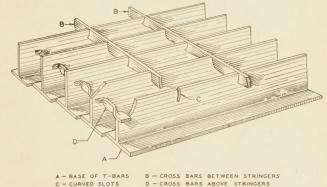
ASSEMBLY OF STEEL SECTION OF FIRST SLAB
